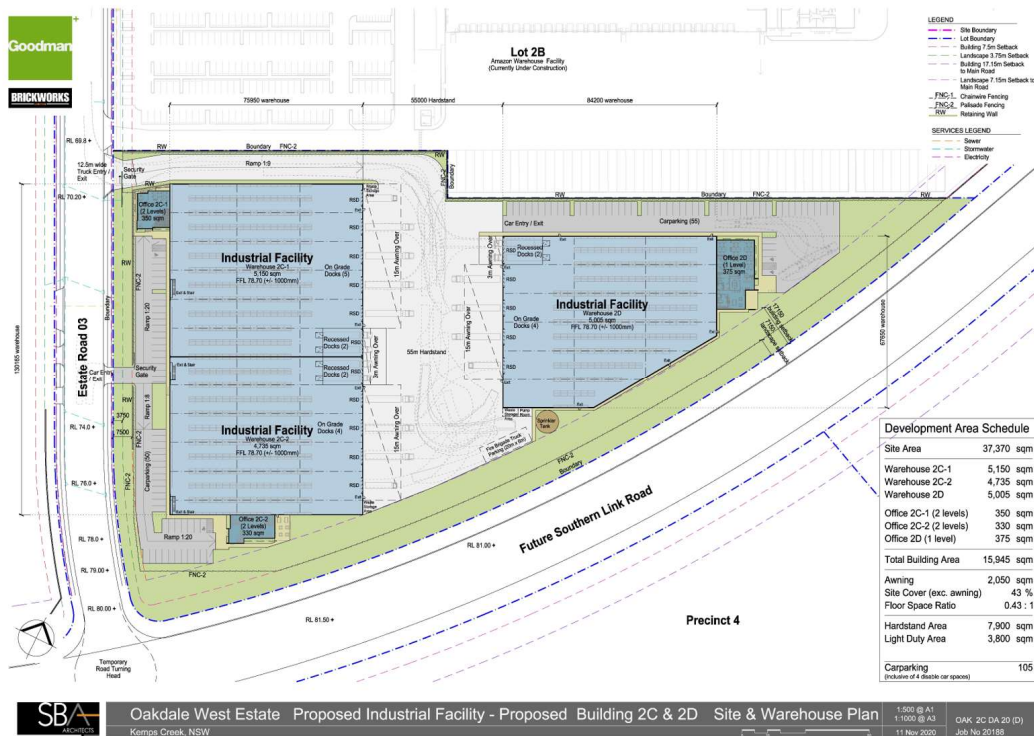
Proposed layout - Buildings 2C and 2D (SBA)
